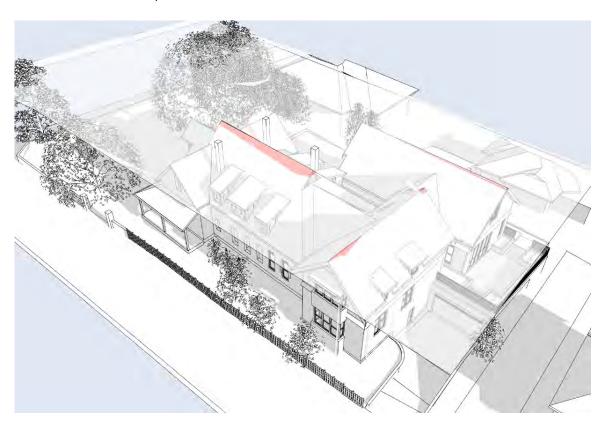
Architectural Extract – Extent of proposed new building form to new rear wing which exceeds the 9.5m height control (portions of existing building which are unchanged are not included in this request)
